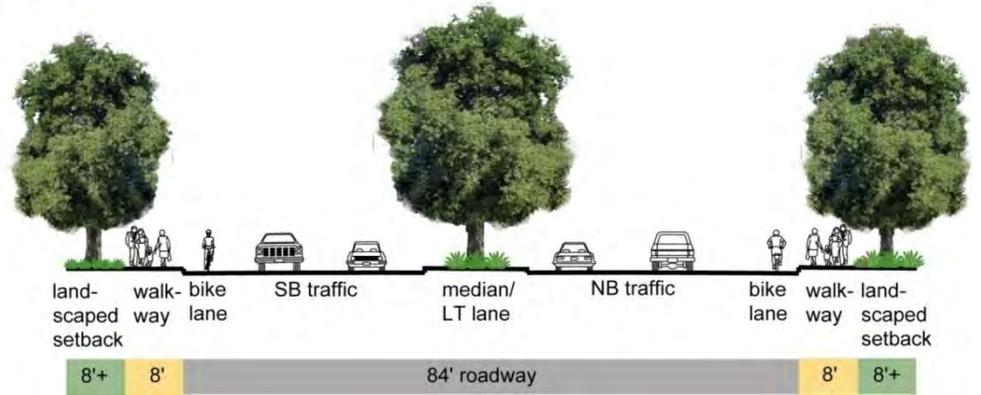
B Cabot Road: Cross Sections—Looking North
